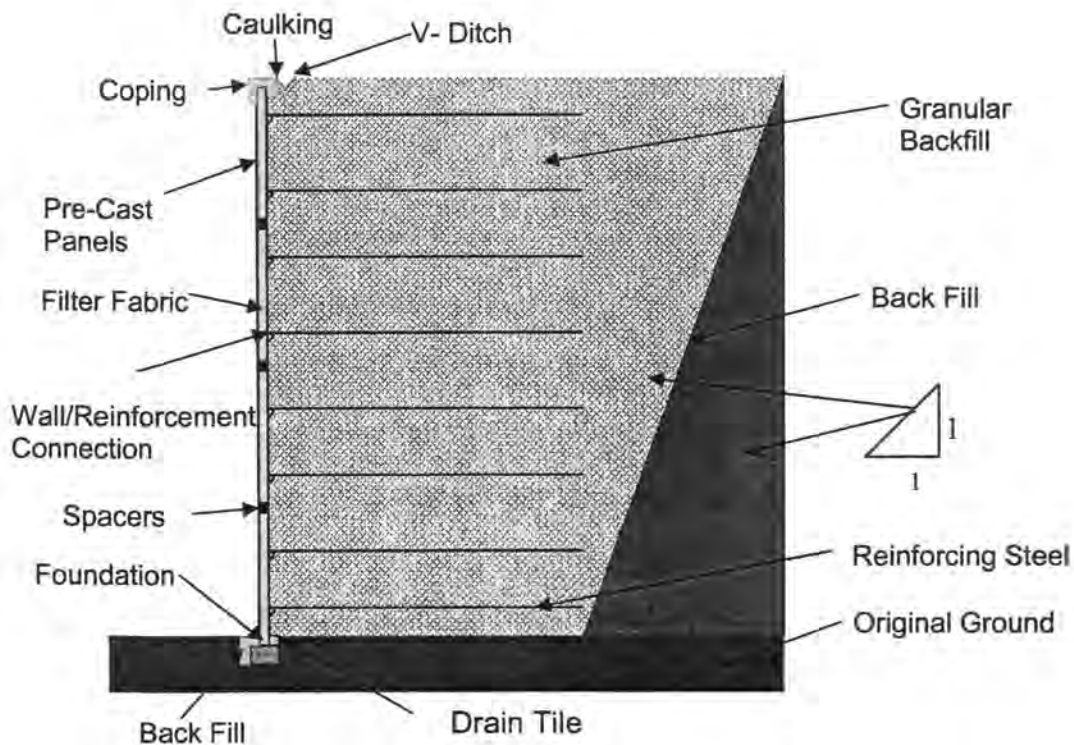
Picture showing the components of Mechanically Stabilized Earth (MSE) Retaining wall
